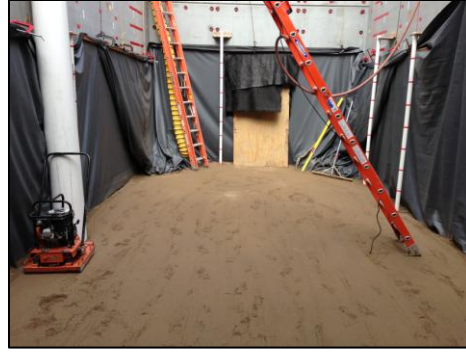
General view of the installed entry and observation pipes (photo taken from west side looking east).
